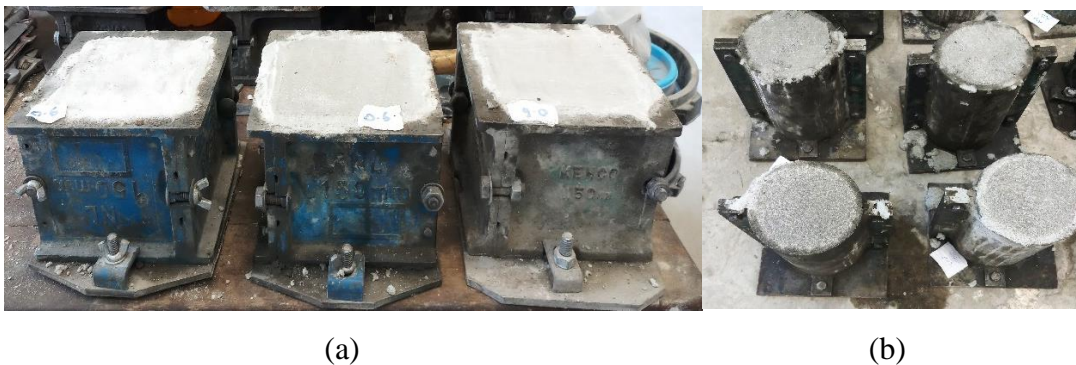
Sample of Concrete Specimen Left for Setting: (a) Cube Specimen; (b) Cylinder Specimen
